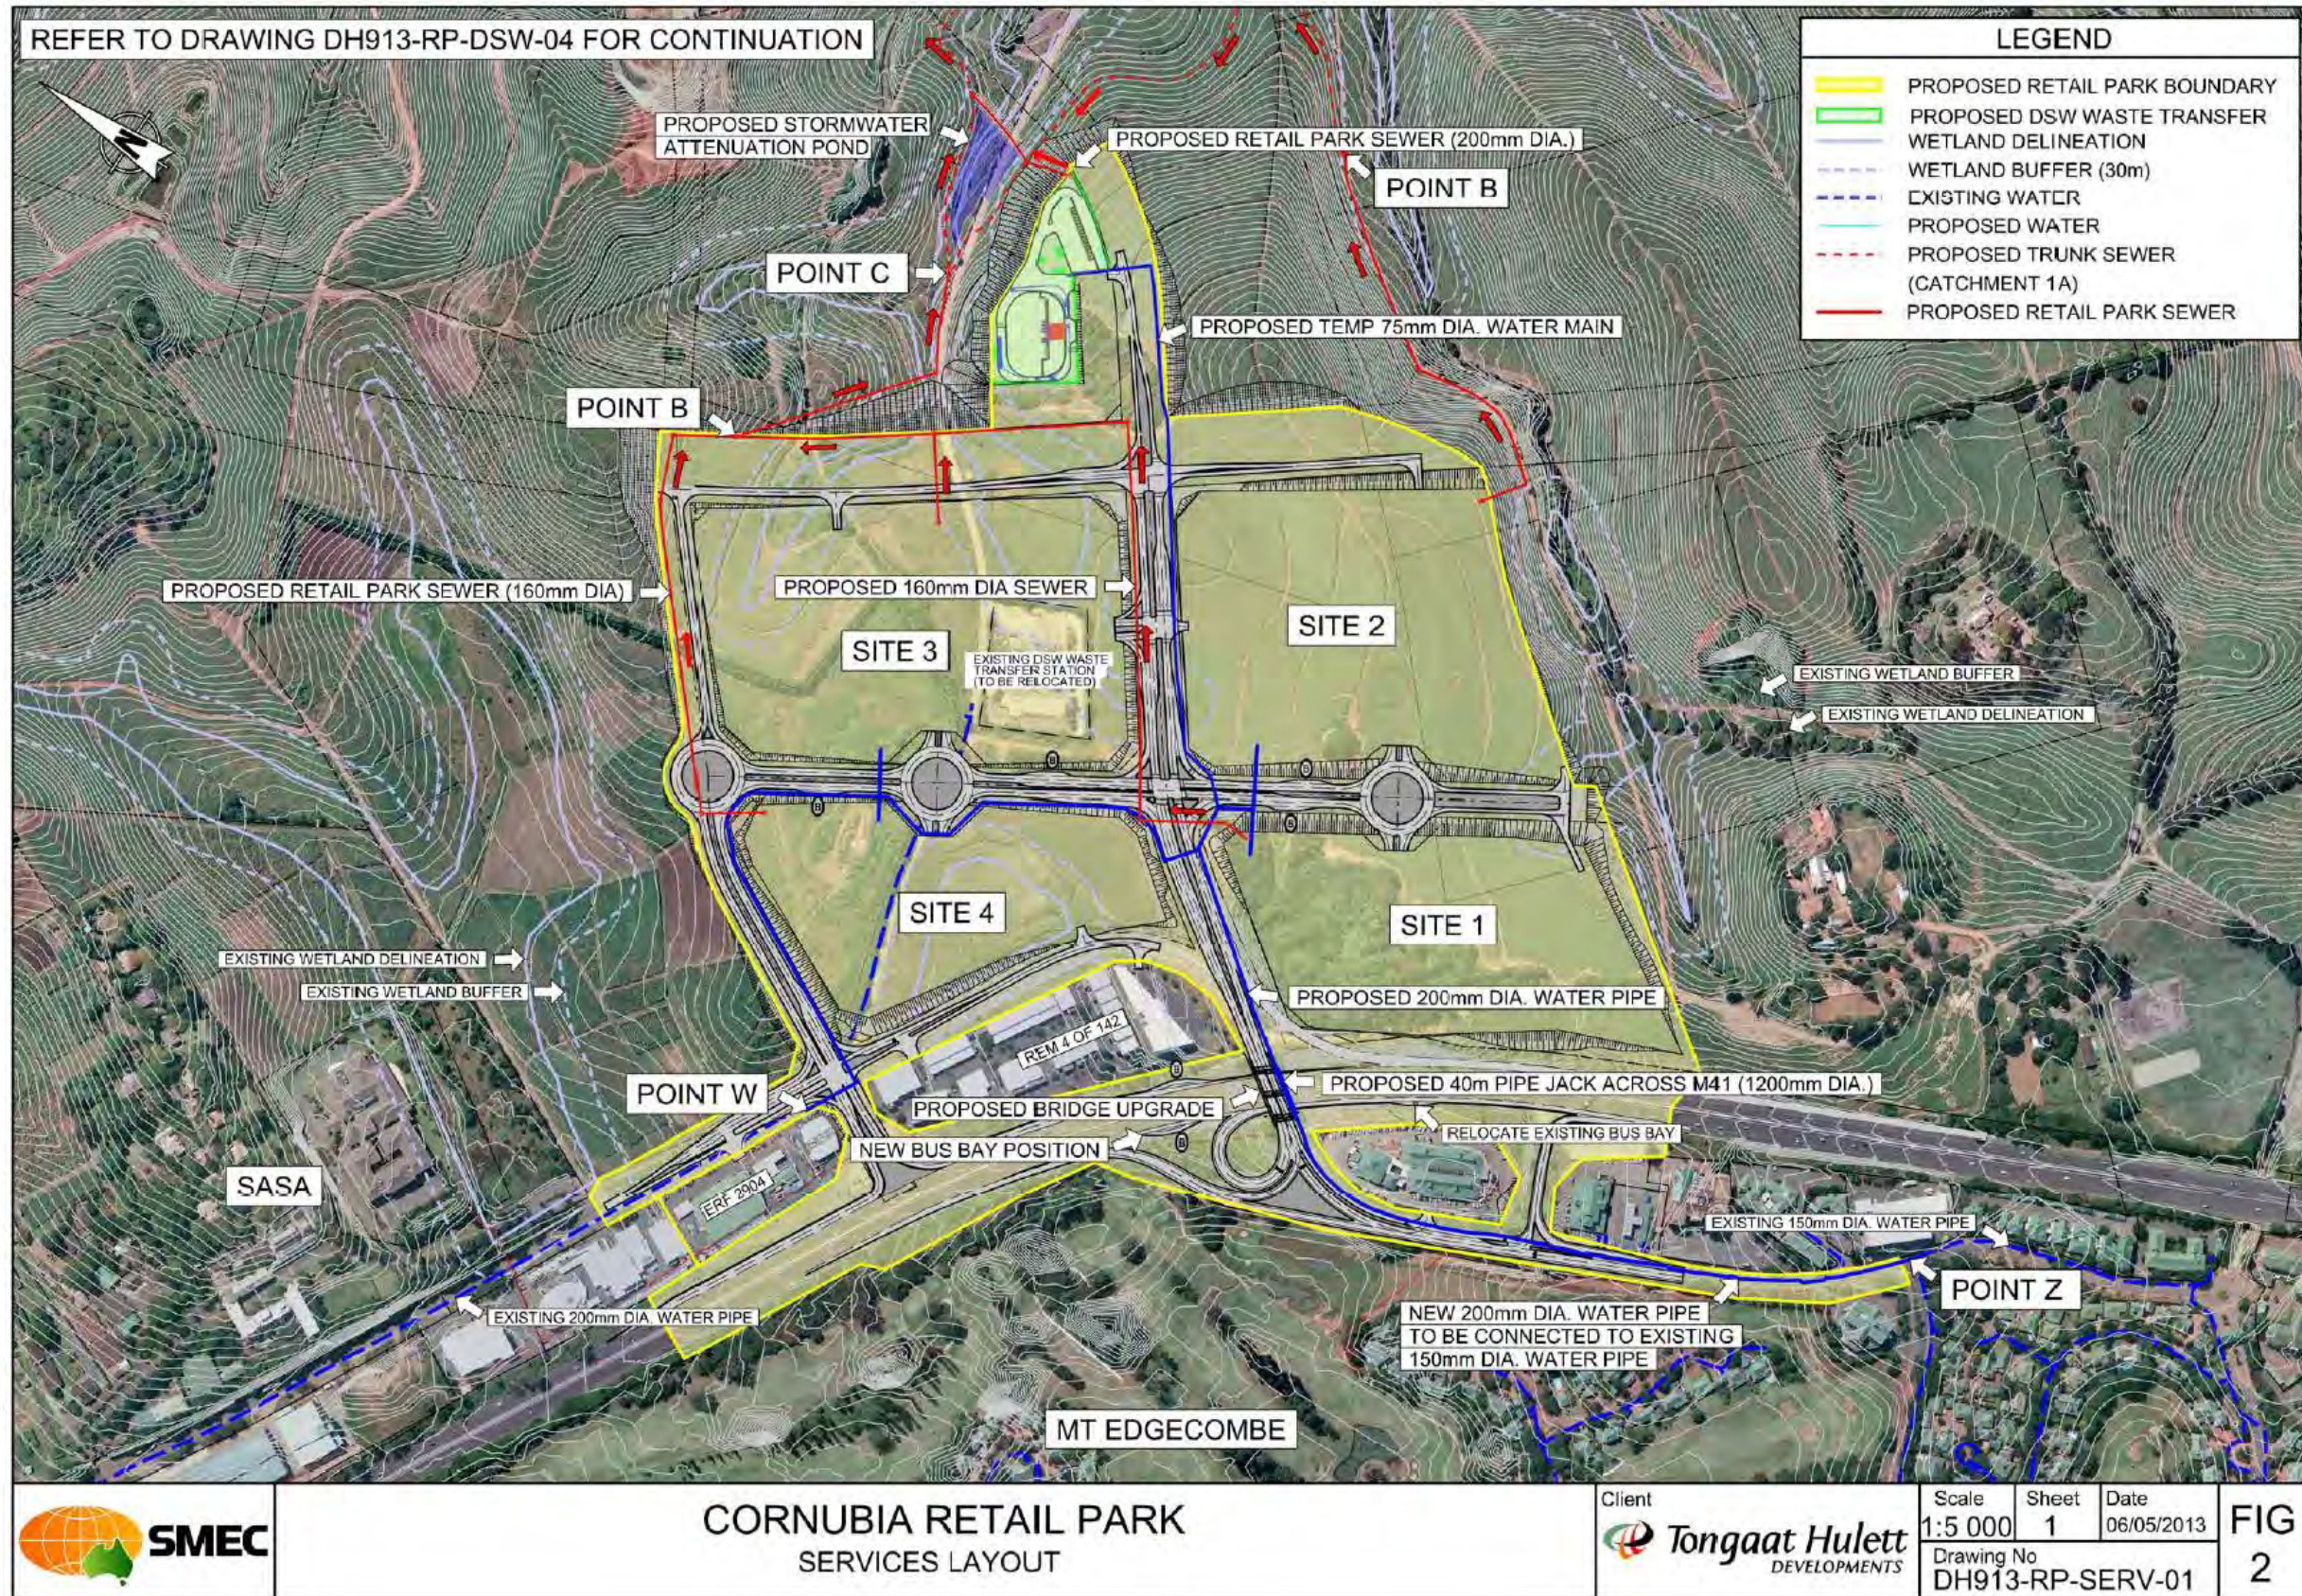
Layout of Alternative Site 1 for the Cornubia Retail Park
